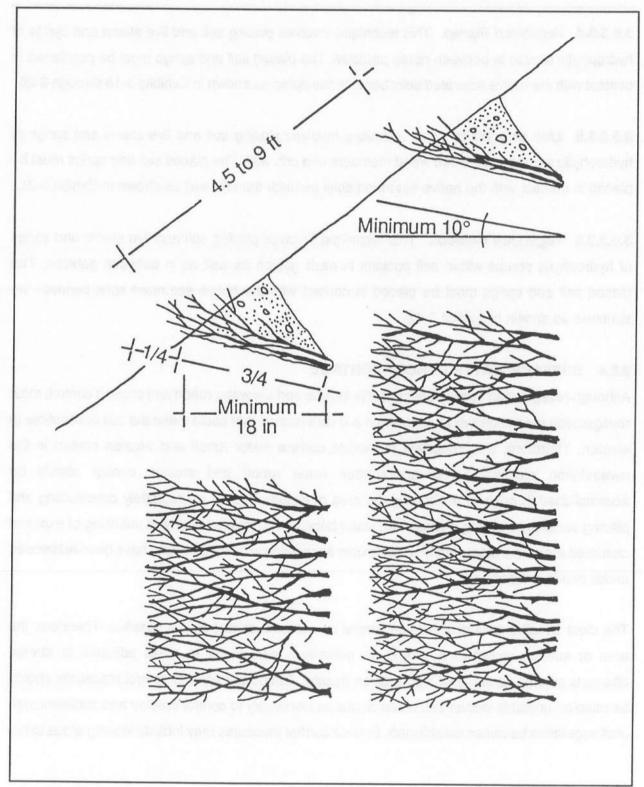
Design and Construction of Brush Layering for Slope Stabilization.
